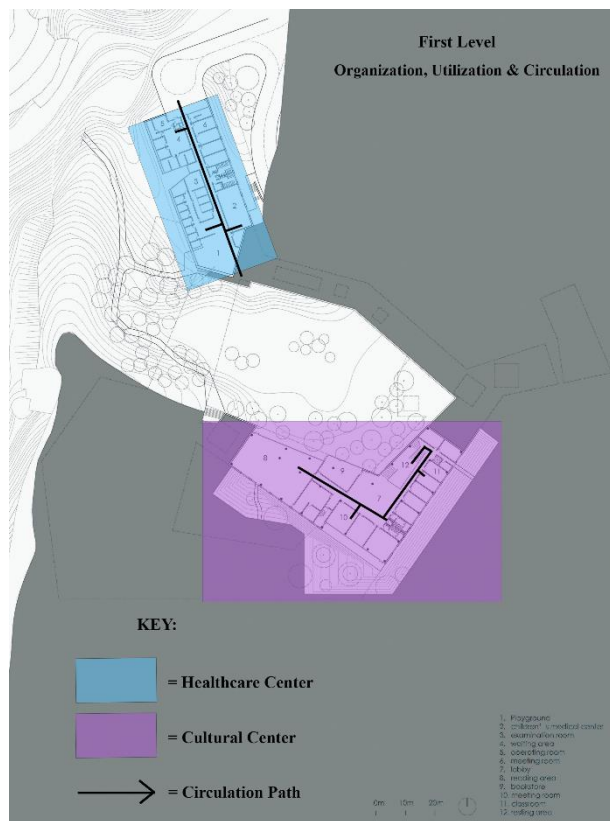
Chongqing Taoyuanju Community Center, First Floor Plan. Adapted from Archdaily & Vector Architects
